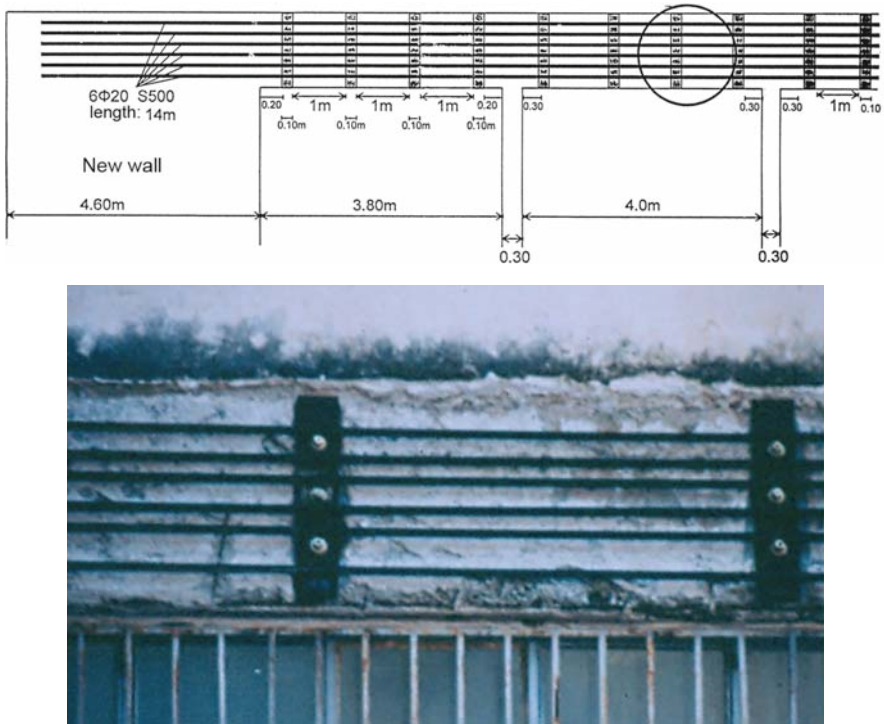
Collector element of the wall in Fig. 6.5, fastened to the side of the perimeter beam (See also Colour Plate 16 on page 729)
